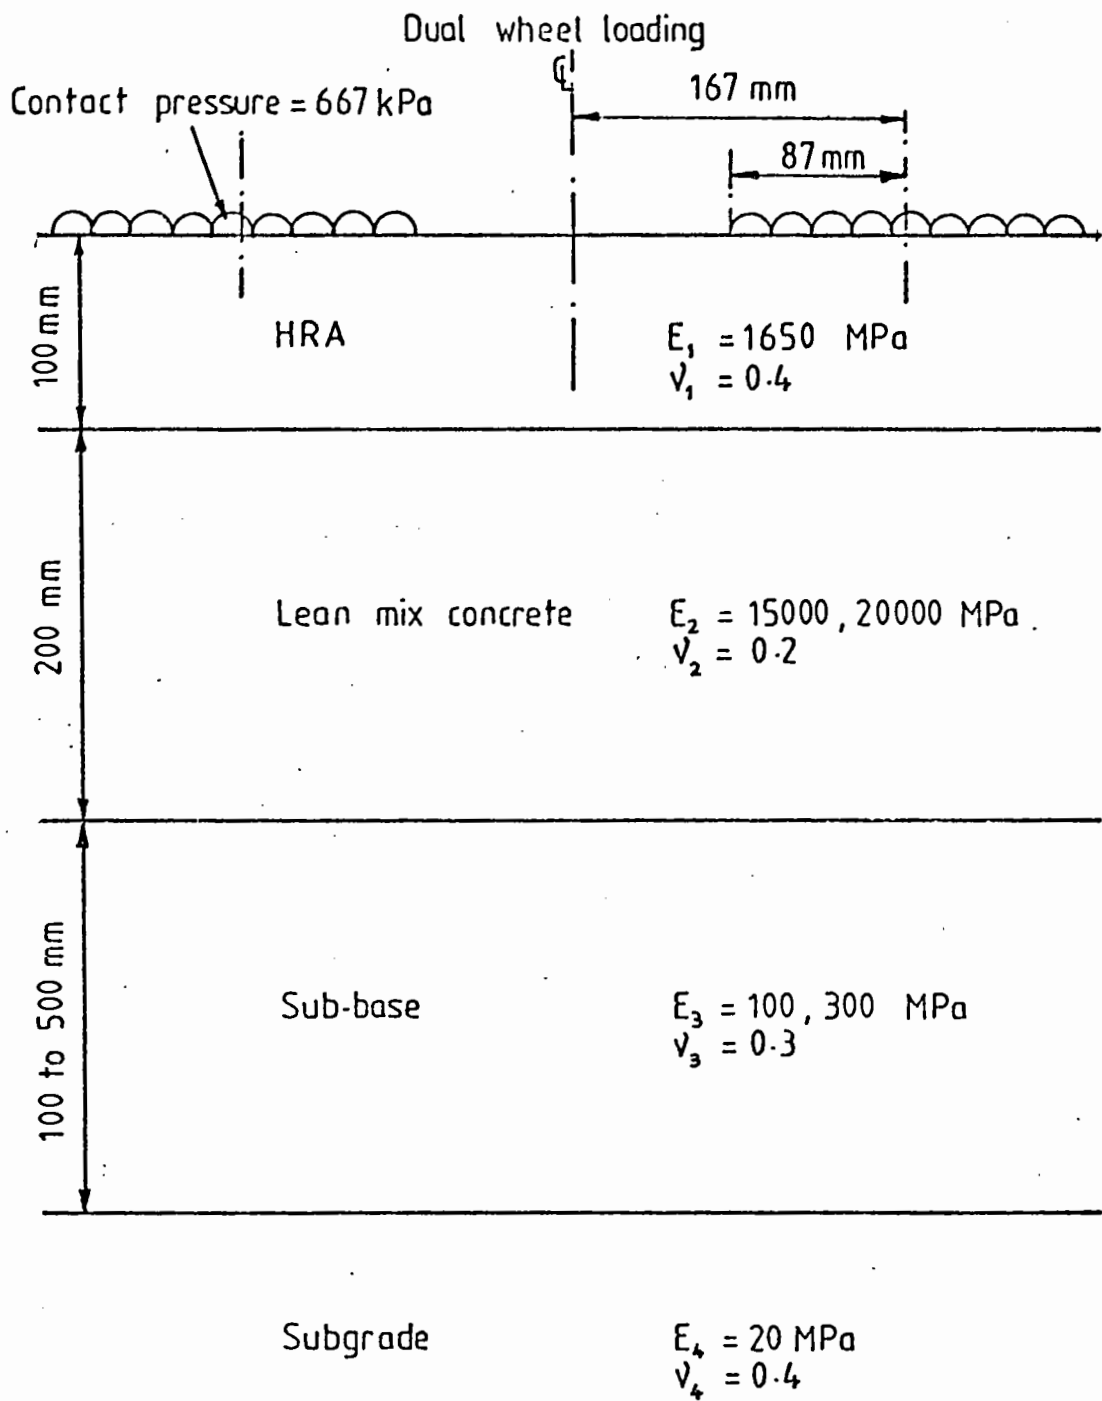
EXISTING STRUCTURE AND LOADING ARRANGEMENT USED IN DEFLECTION CALCULATIONS A 52 DERBY ROAD NOTTINGHAM
